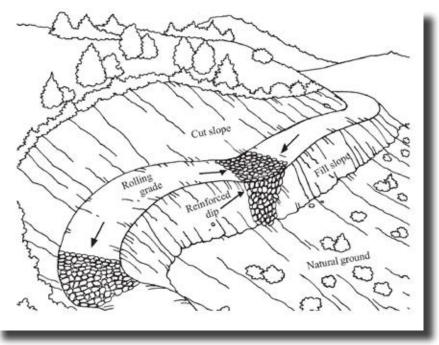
Basic road surface drainage with rolling grades and reinforced dips.
